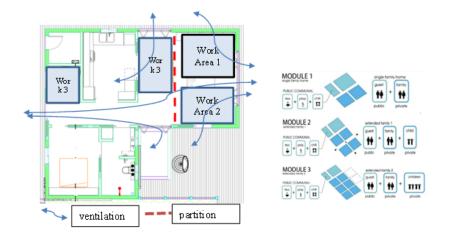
Internal layout with cross ventilation and design of open home-office design concept
